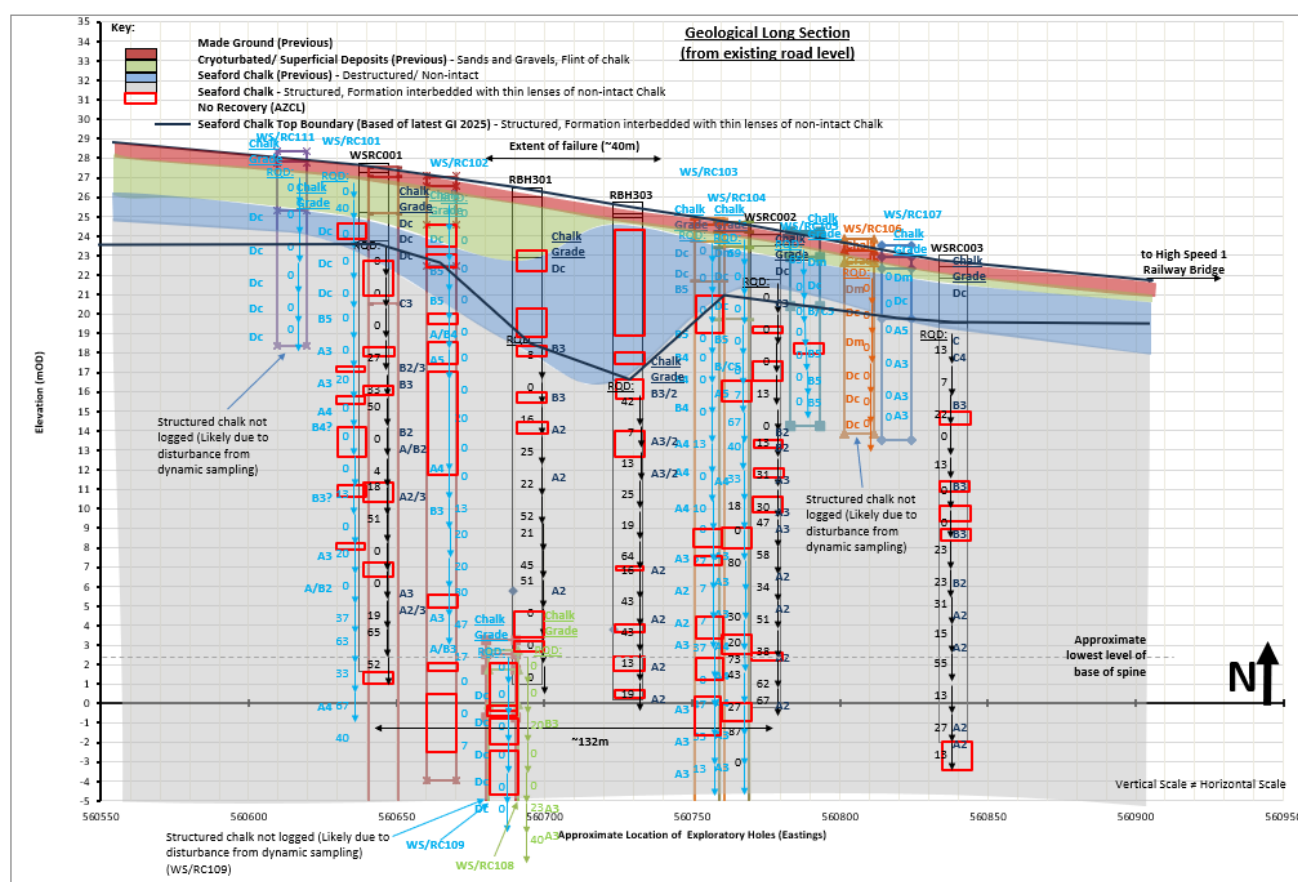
Geotechnical Long Section of the Failed Zone and Surrounding Area
